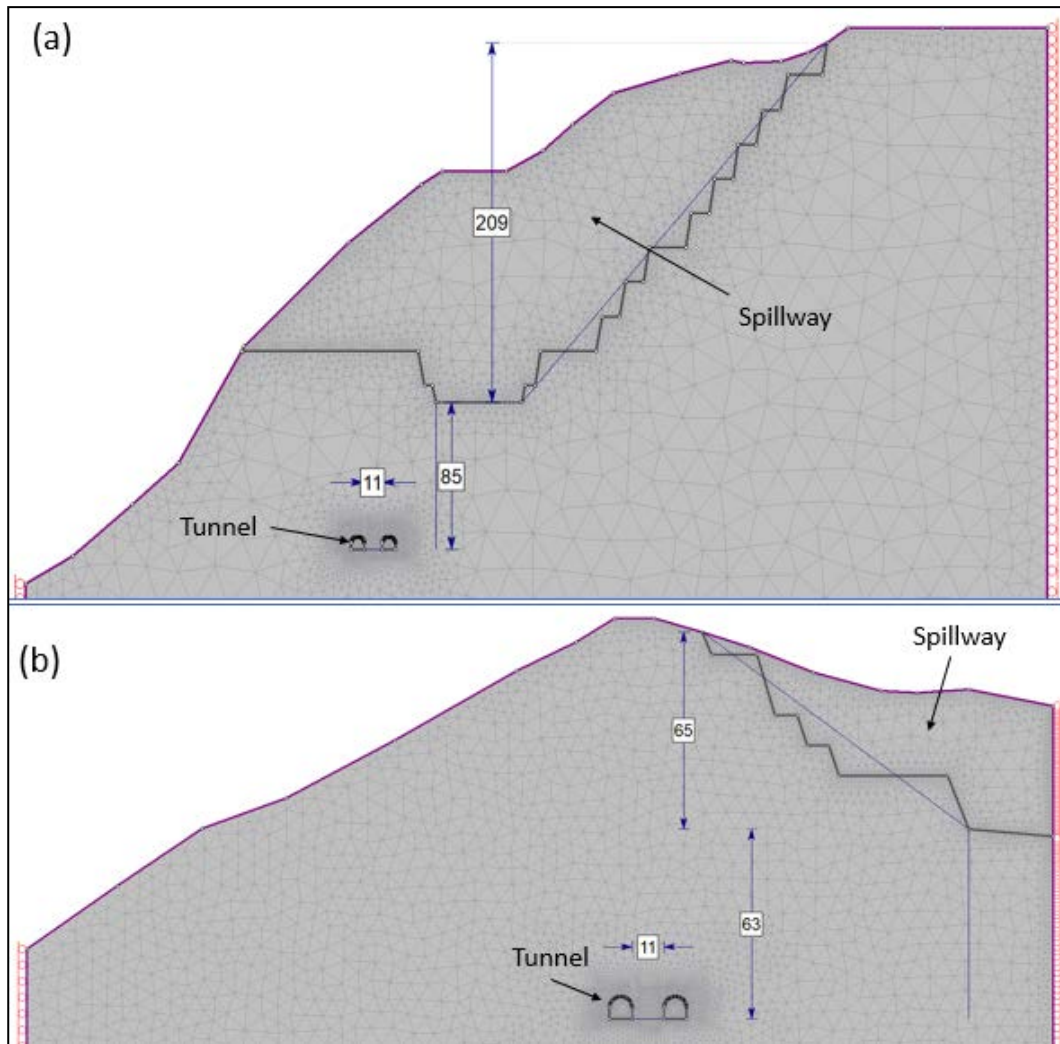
Analysis sections for conveyance tunnels: a) Section 3; b) Section 4
